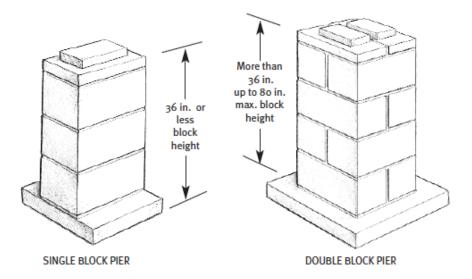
Concrete Block Pier Configuration (MHRA, 2002)
